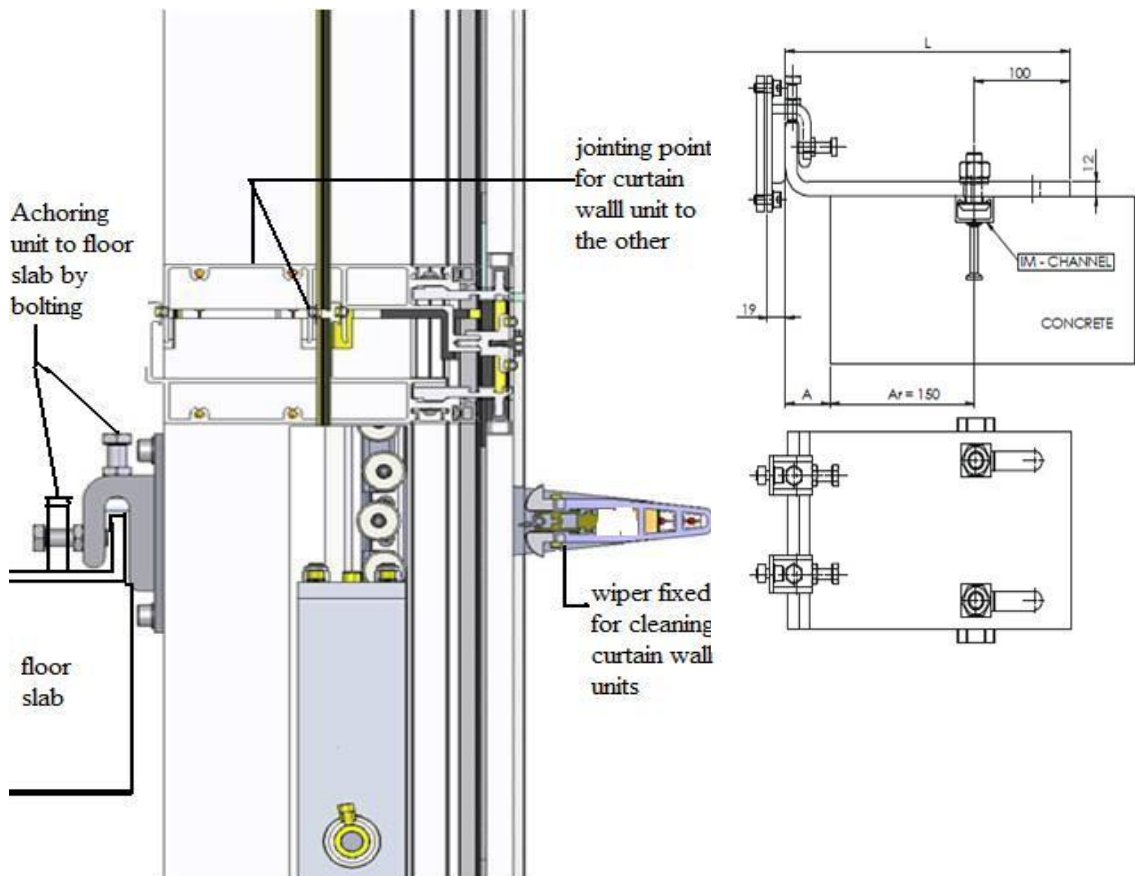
Anchoring View for Unitized Unit of Curtain Wall for Al-Jawhara Tower (iku® intelligente Fenstersysteme AG. 2008).
